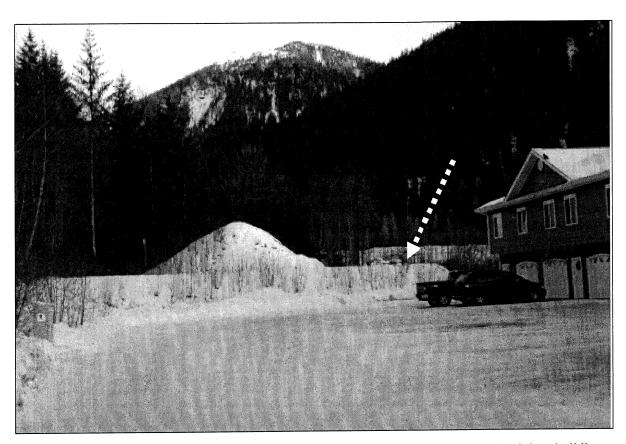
A future apartment building would be location (see arrow) beyond the condominium building shown in the picture. Photograph taken by staff on 12-26-12
